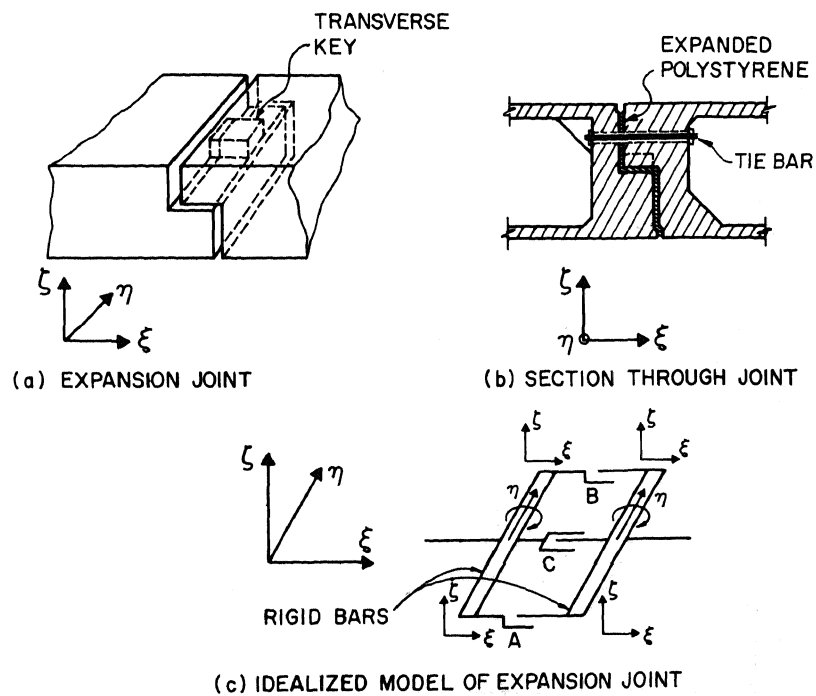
IDEALIZATION OF BRIDGE EXPANSION JOINT
